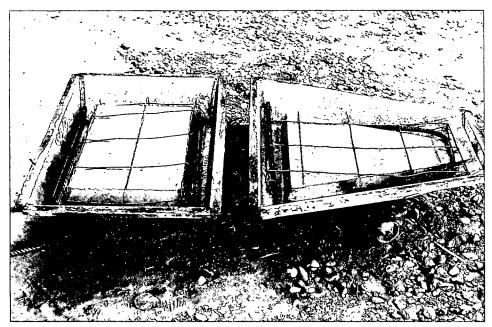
Galvanized metal forms for pouring precast weir sill and upstream ramp.
